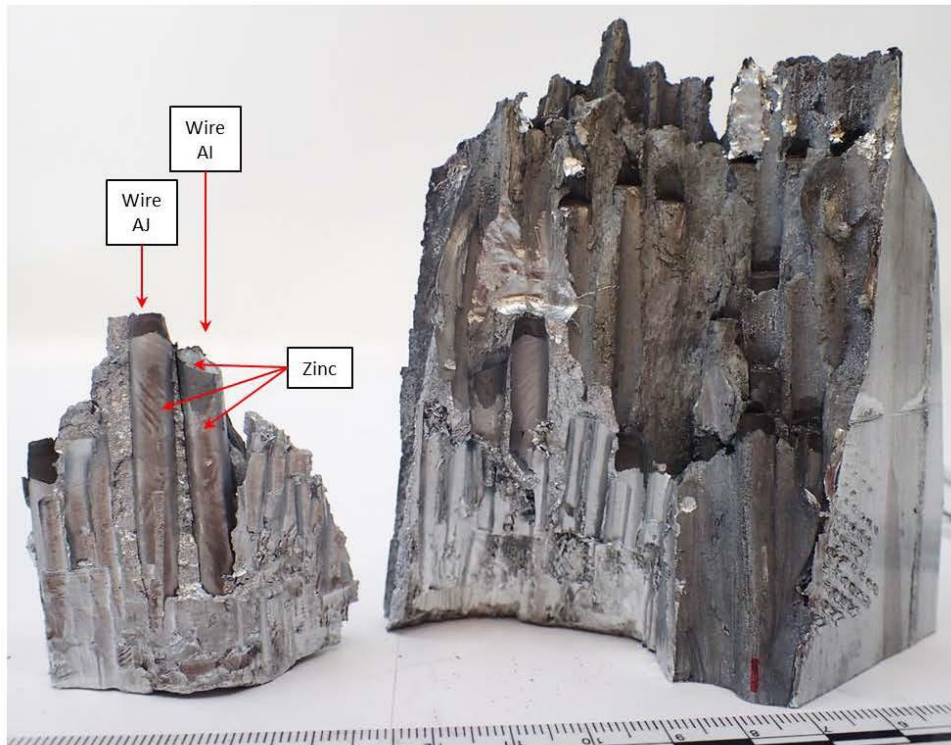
Wires AI and AJ both have visibly good adhesion of zinc along their wire surfaces that were embedded in slice 3g. Note that the thin layer of zinc on wire AI continues from the wire outer diameter surface onto the shear fracture surface. Scale in centimeters.
